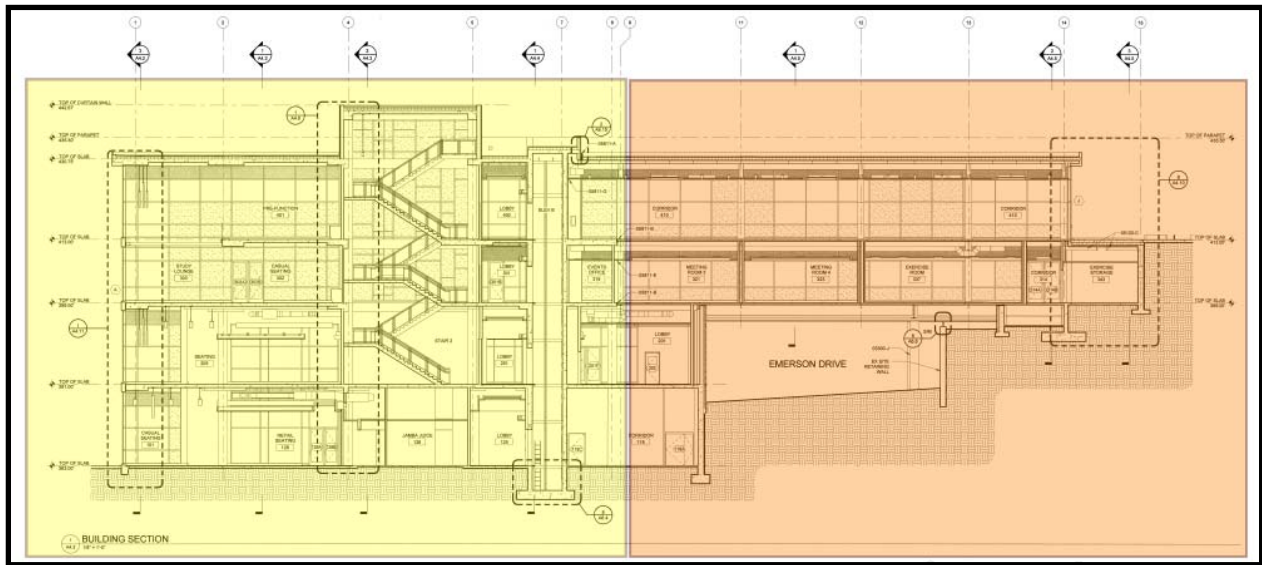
Building Section showing different structural components. The yellow section is the north end made of structural concrete and the red section is the south end made of structural steel.
